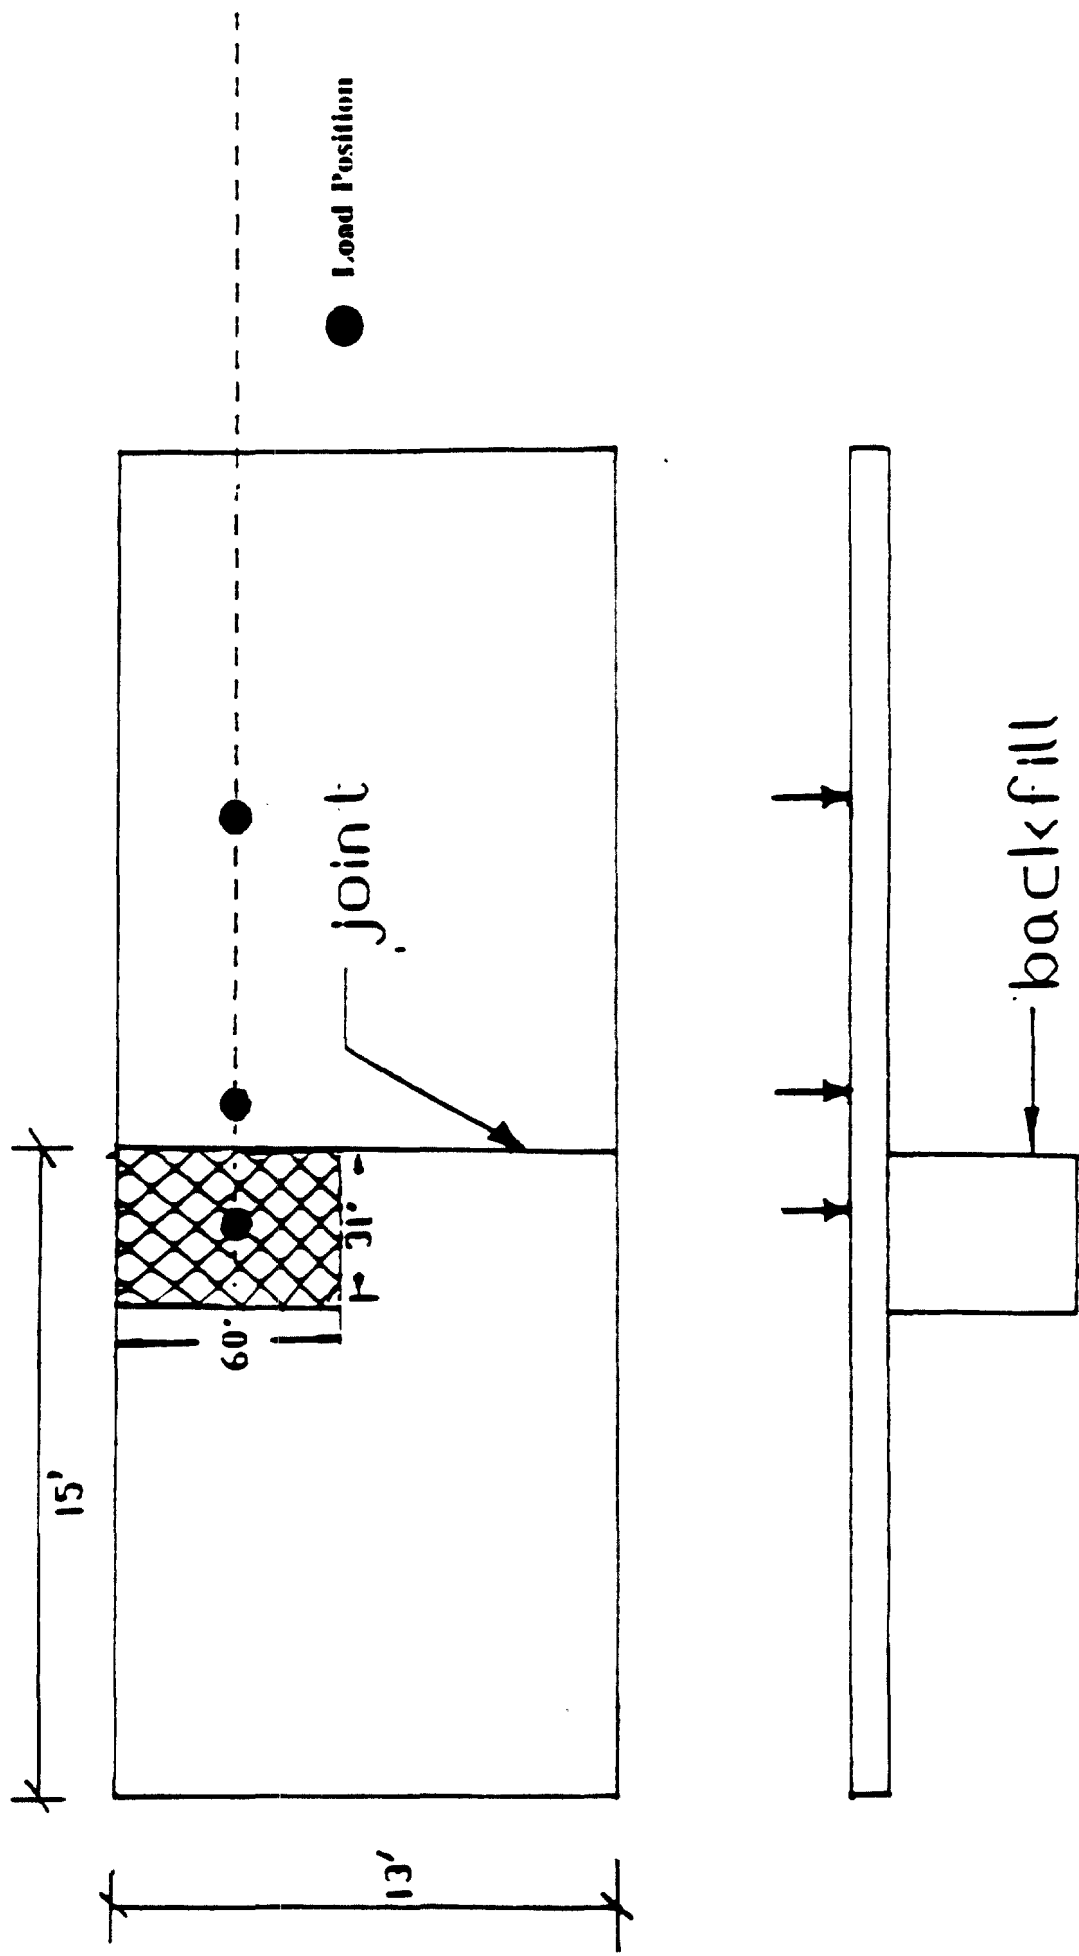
Layout for Dynaflect Tests on Calvert Street
